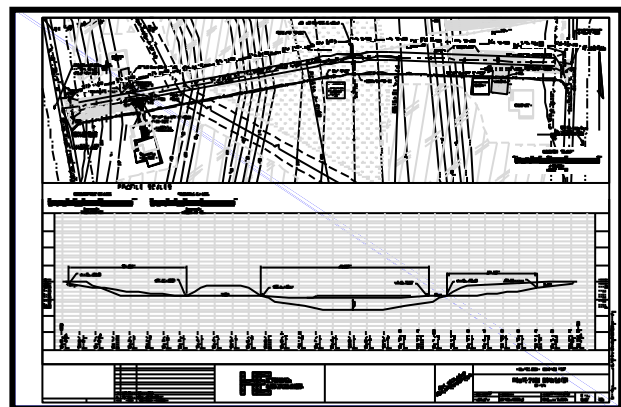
Example of Completed Plan and Profile <sup>2</sup>
